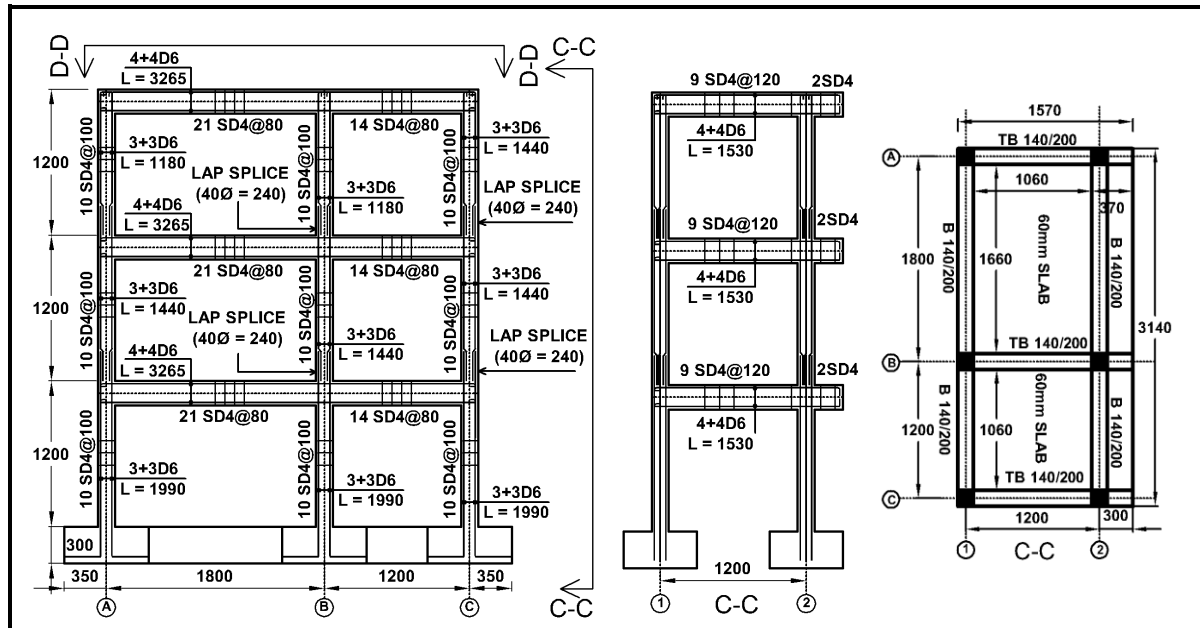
Specimen main dimensions (in millimetres) and reinforcing layout.
